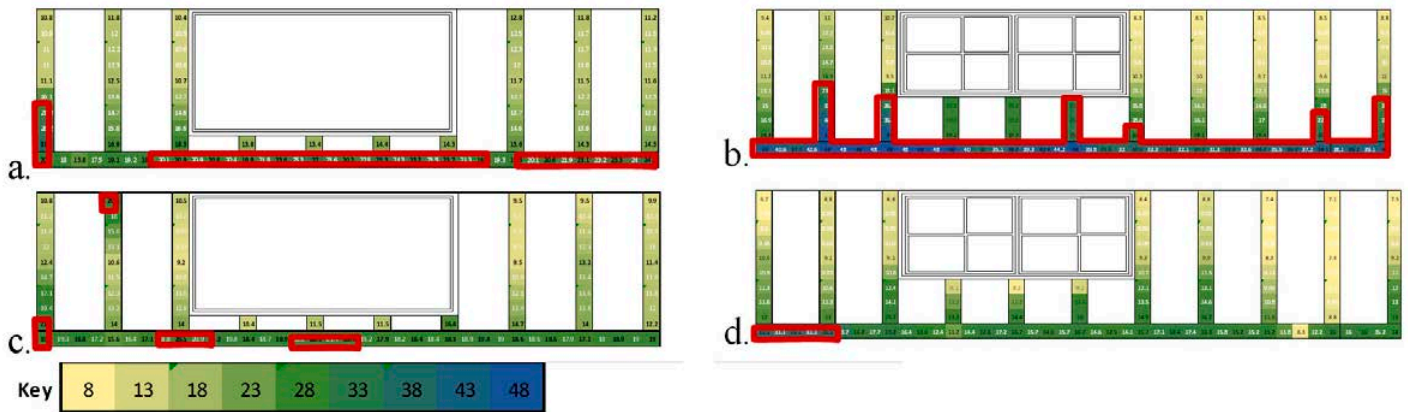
Surface moisture content (%) of timber-frame. Ground floor. Bedroom east wall (a. 02/08/2016 and c. 11/03/2017) Study north wall, (b. 02/08/2016 and d. 11/03/2017). Source: Author's own, 2017.
